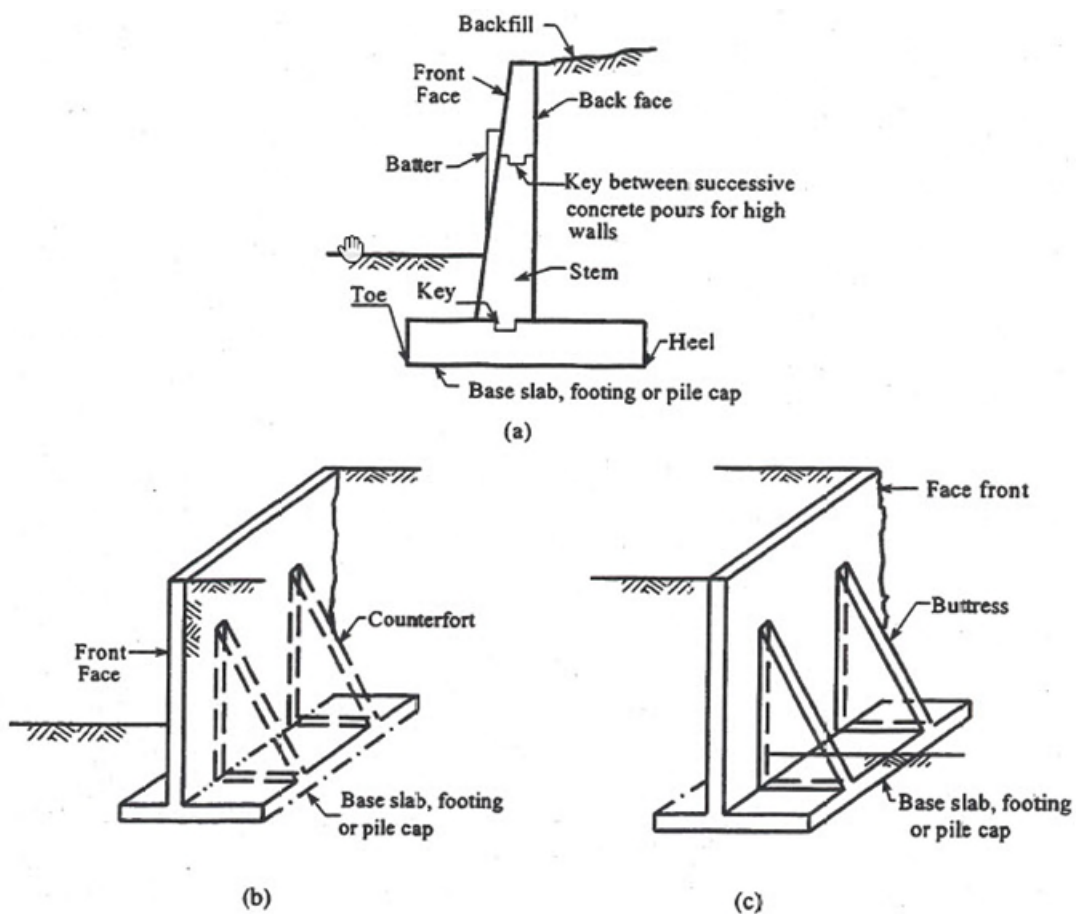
Semi-Gravity Retaining Walls -a) Cantilever, b) Counterfort, c) Buttress (Earth Retaining Structures, June 2006)
